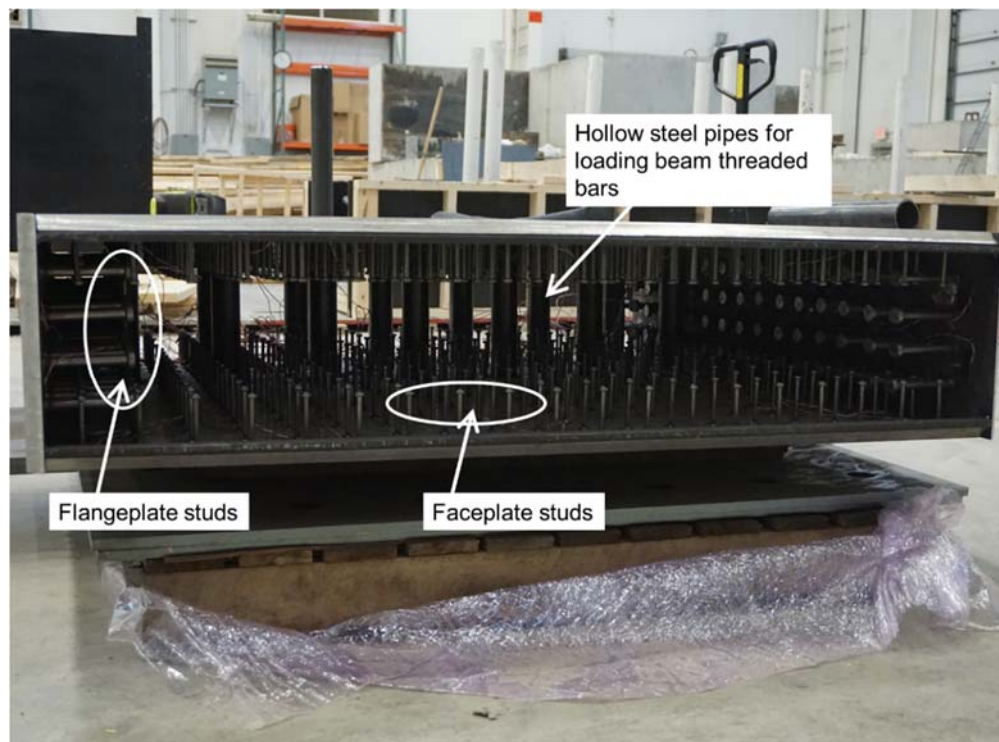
SC-W-H: Welded steel assembly (another view)
